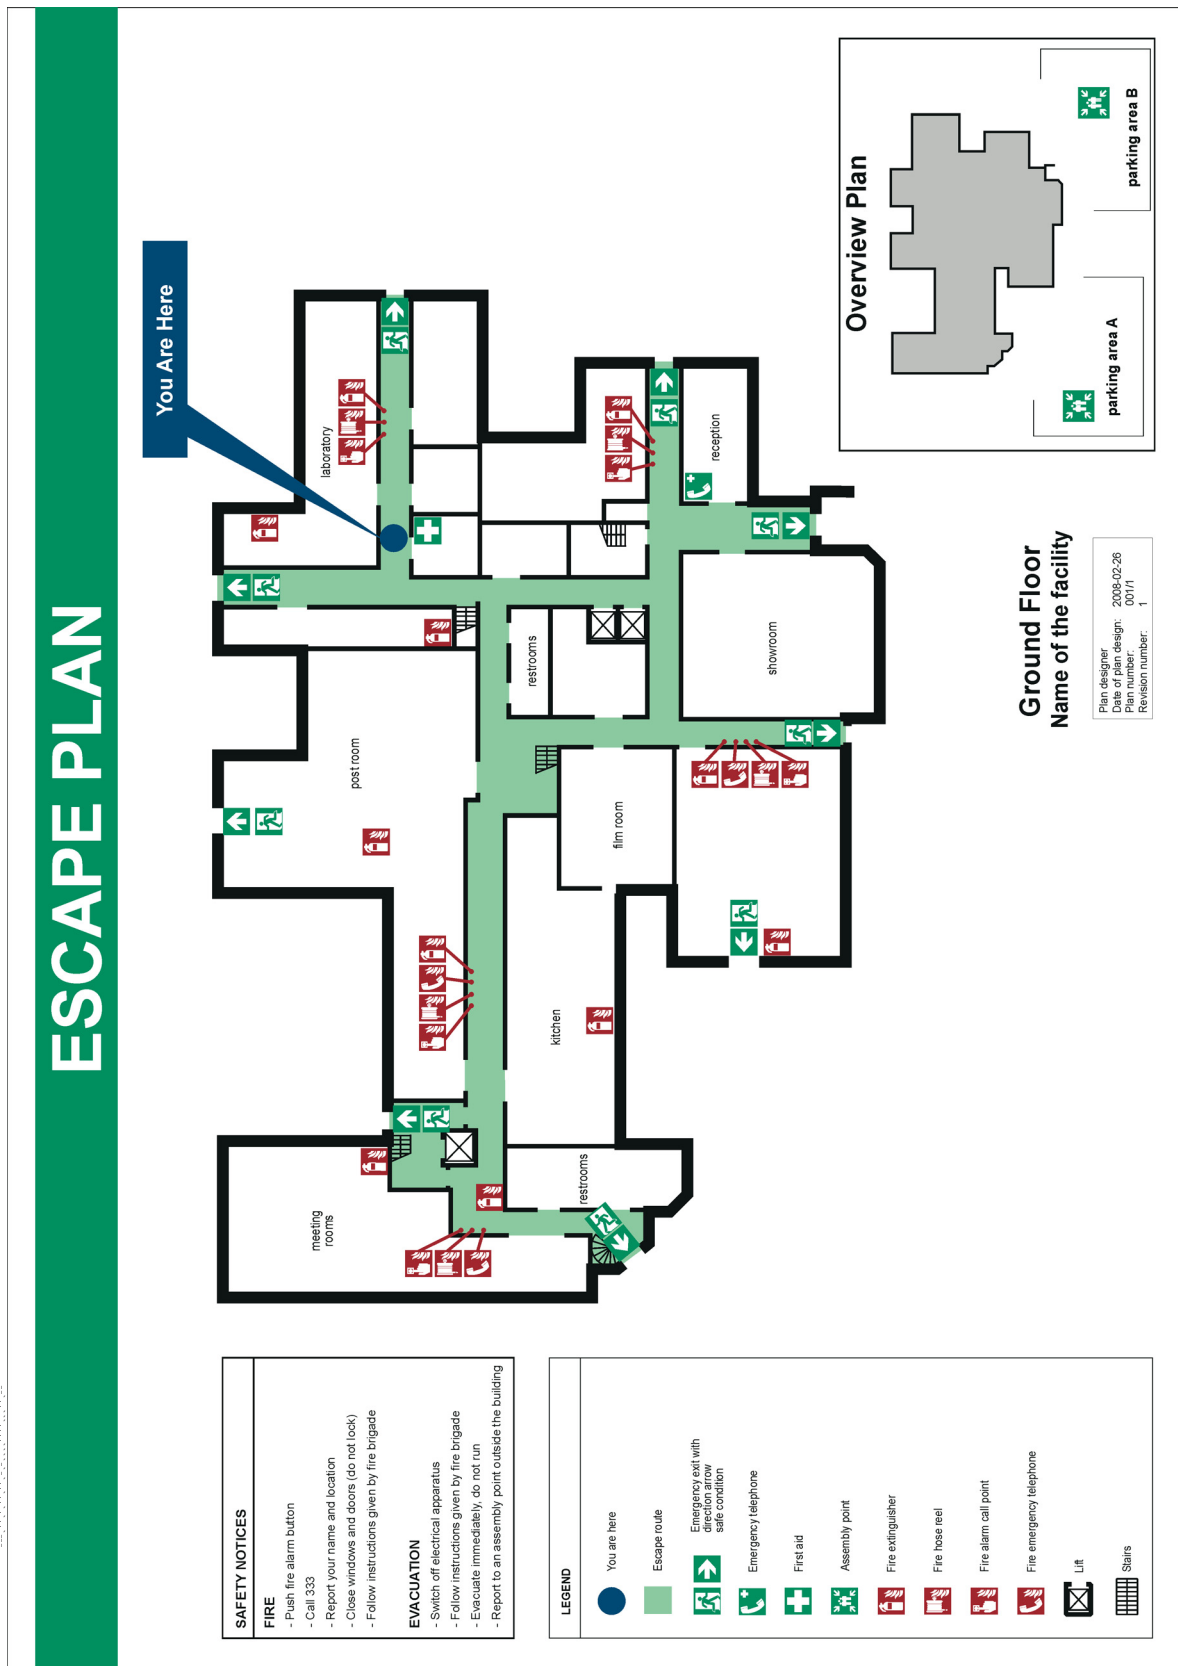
Example of an escape plan without directional arrows — Complete floor
